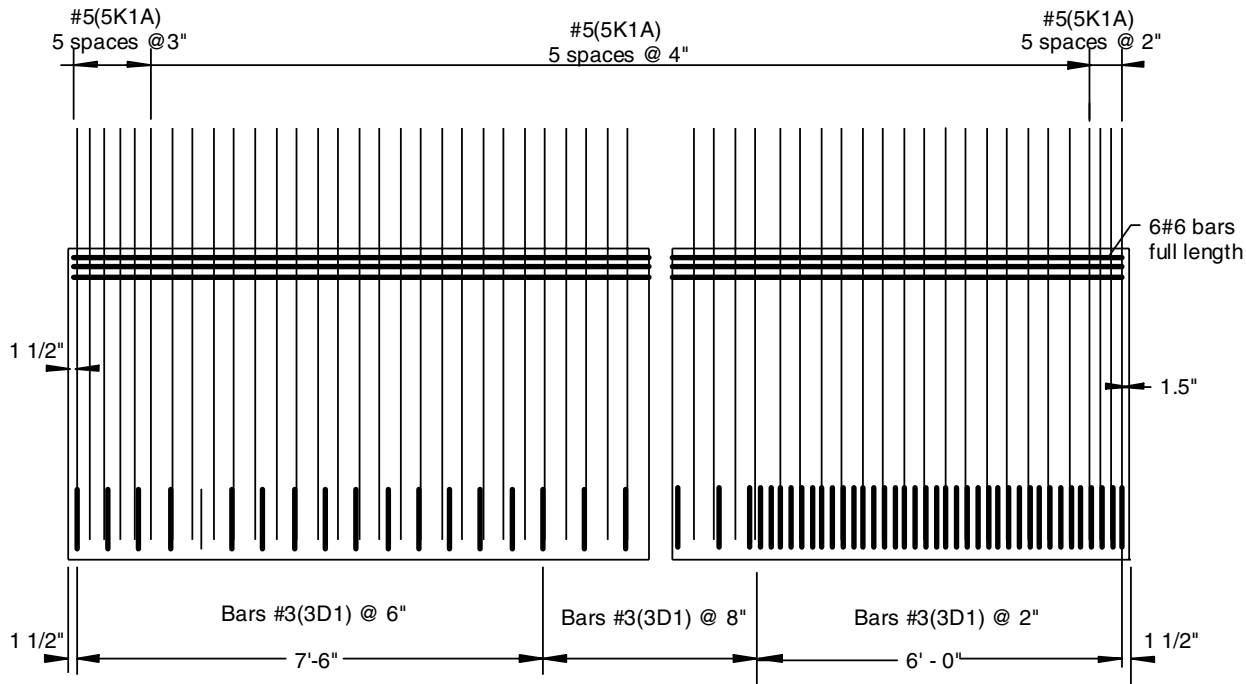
End zone reinforcement details of FL2L (LRFD) and FL2R (proposed).
